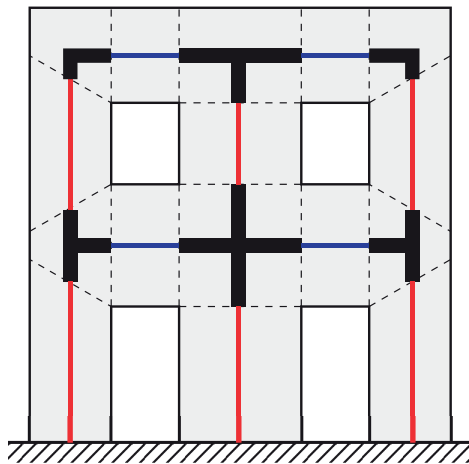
Subdivision of a masonry wall in piers (in red) and spandrels (in blue) by the EF method.
